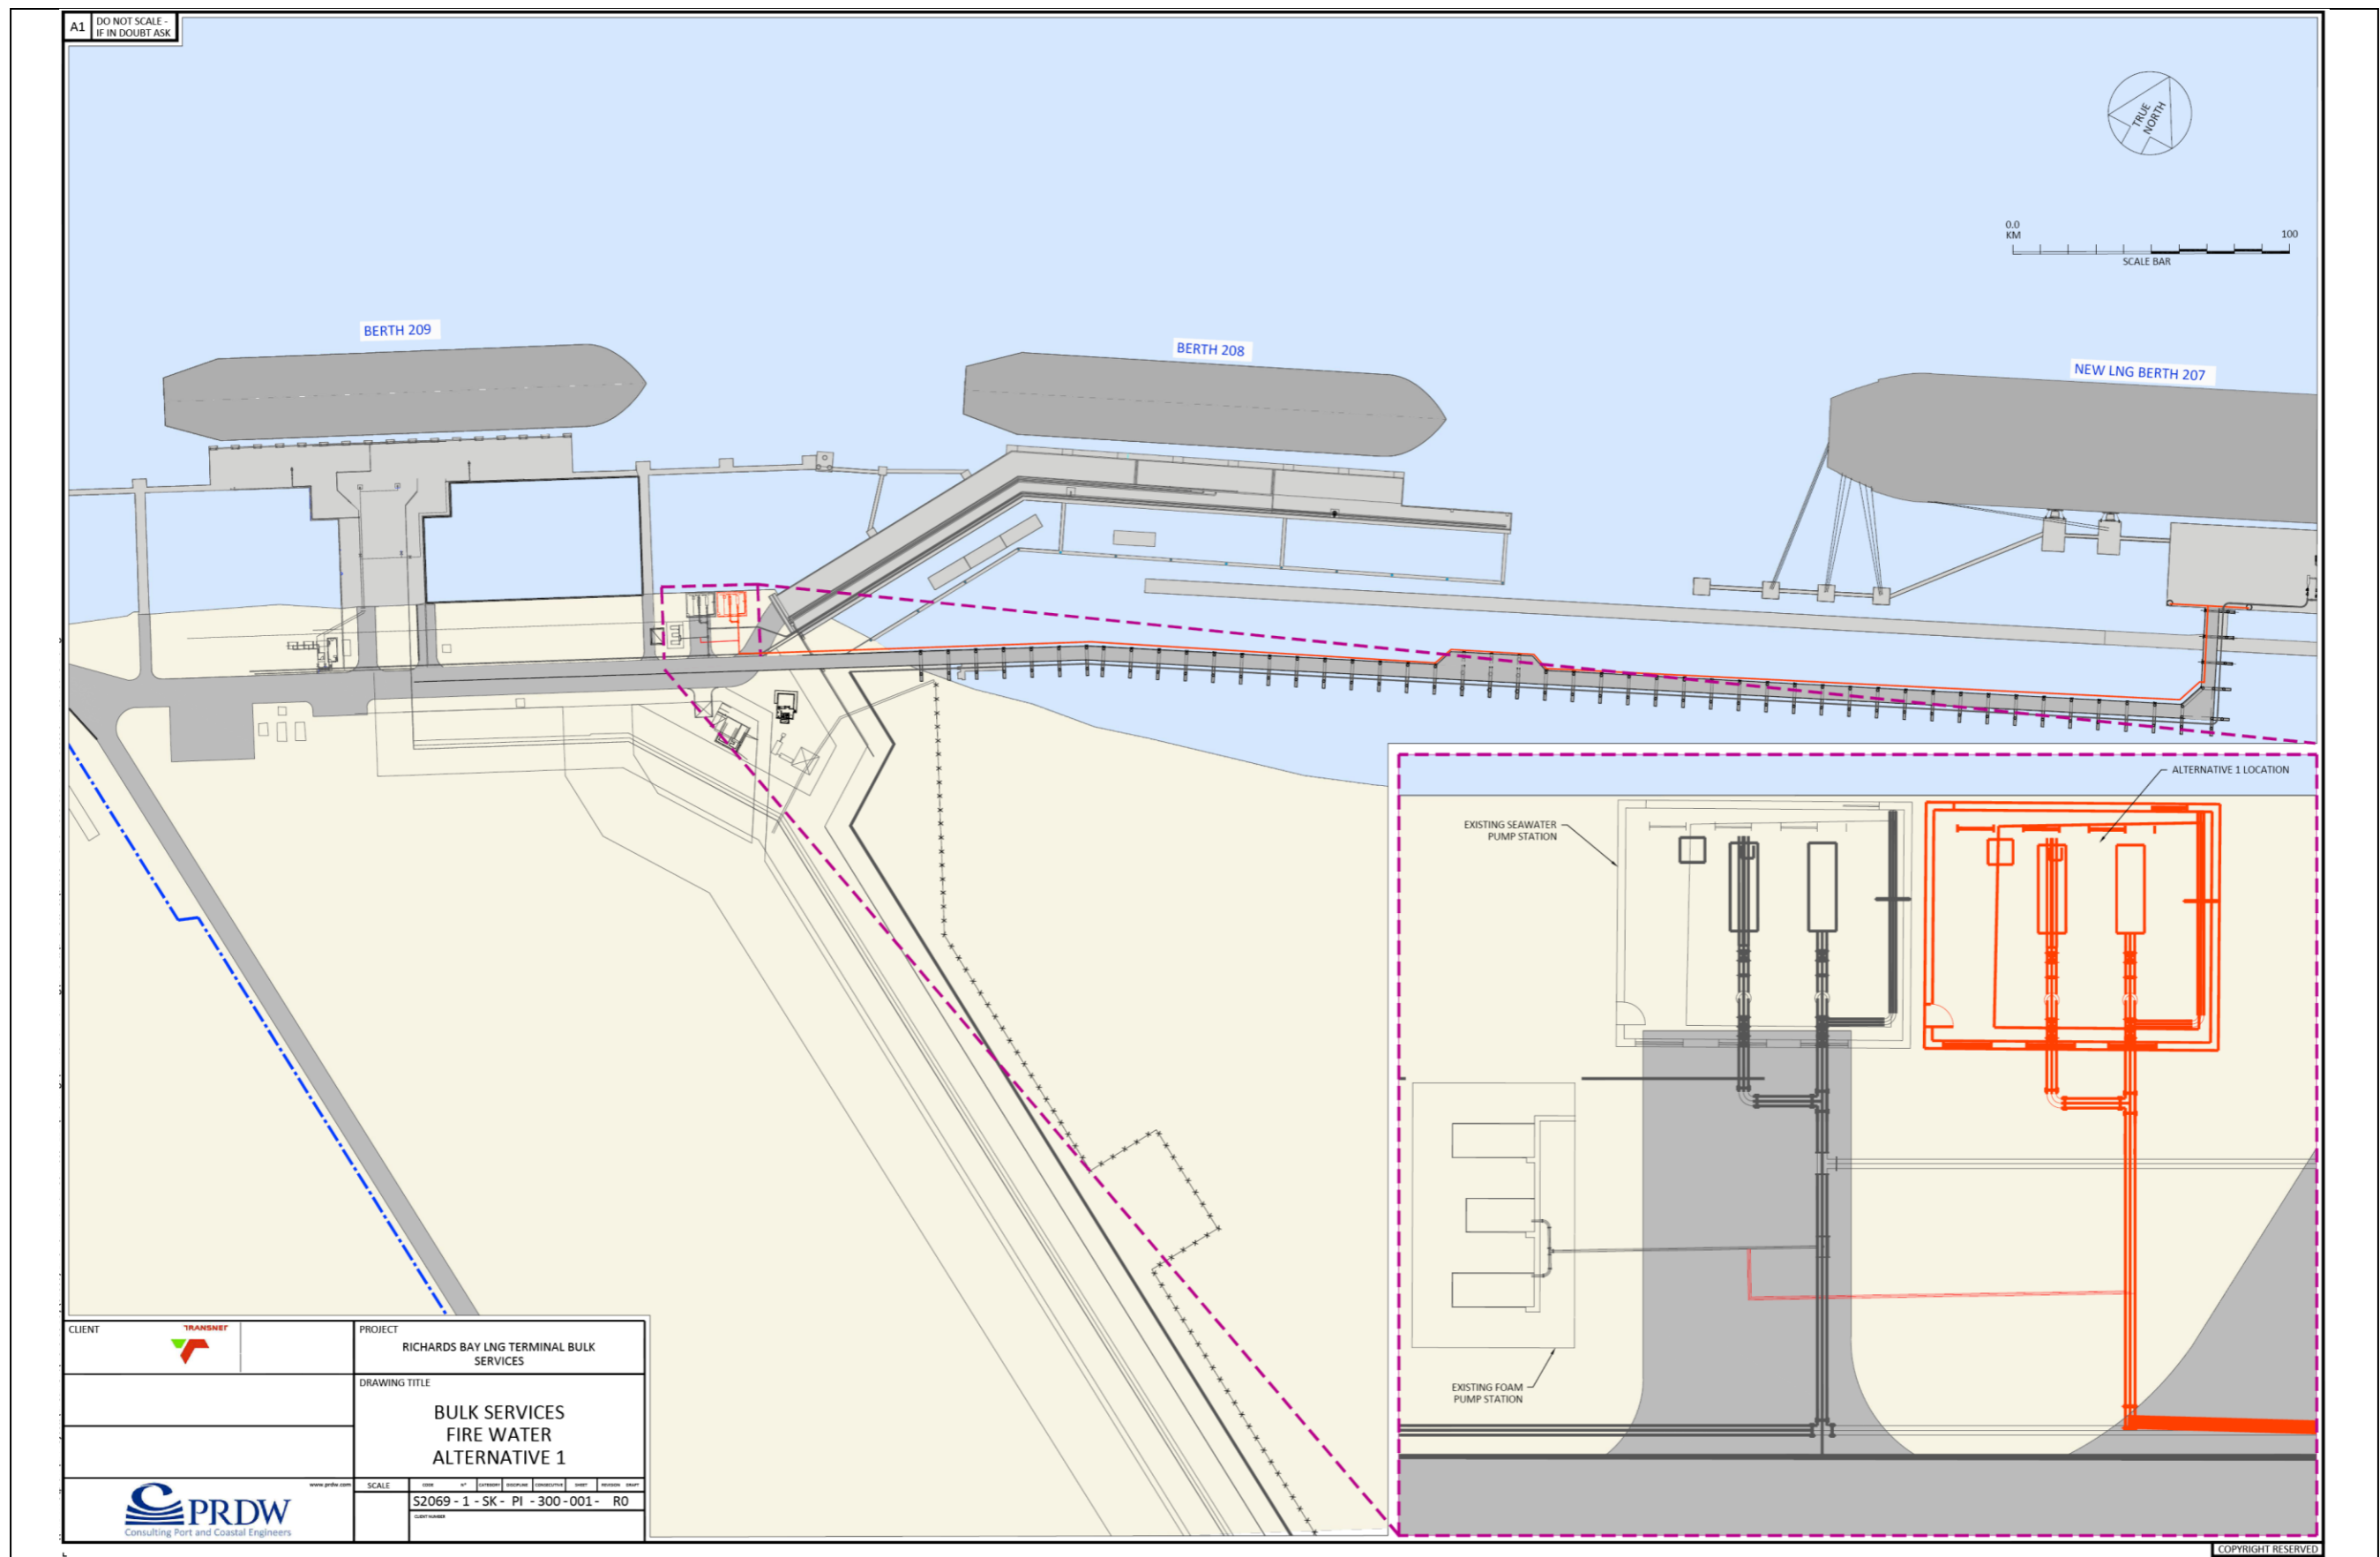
Provision of fire water – Alternative 1 (Note: the red indicates the proposed new infrastructure)
